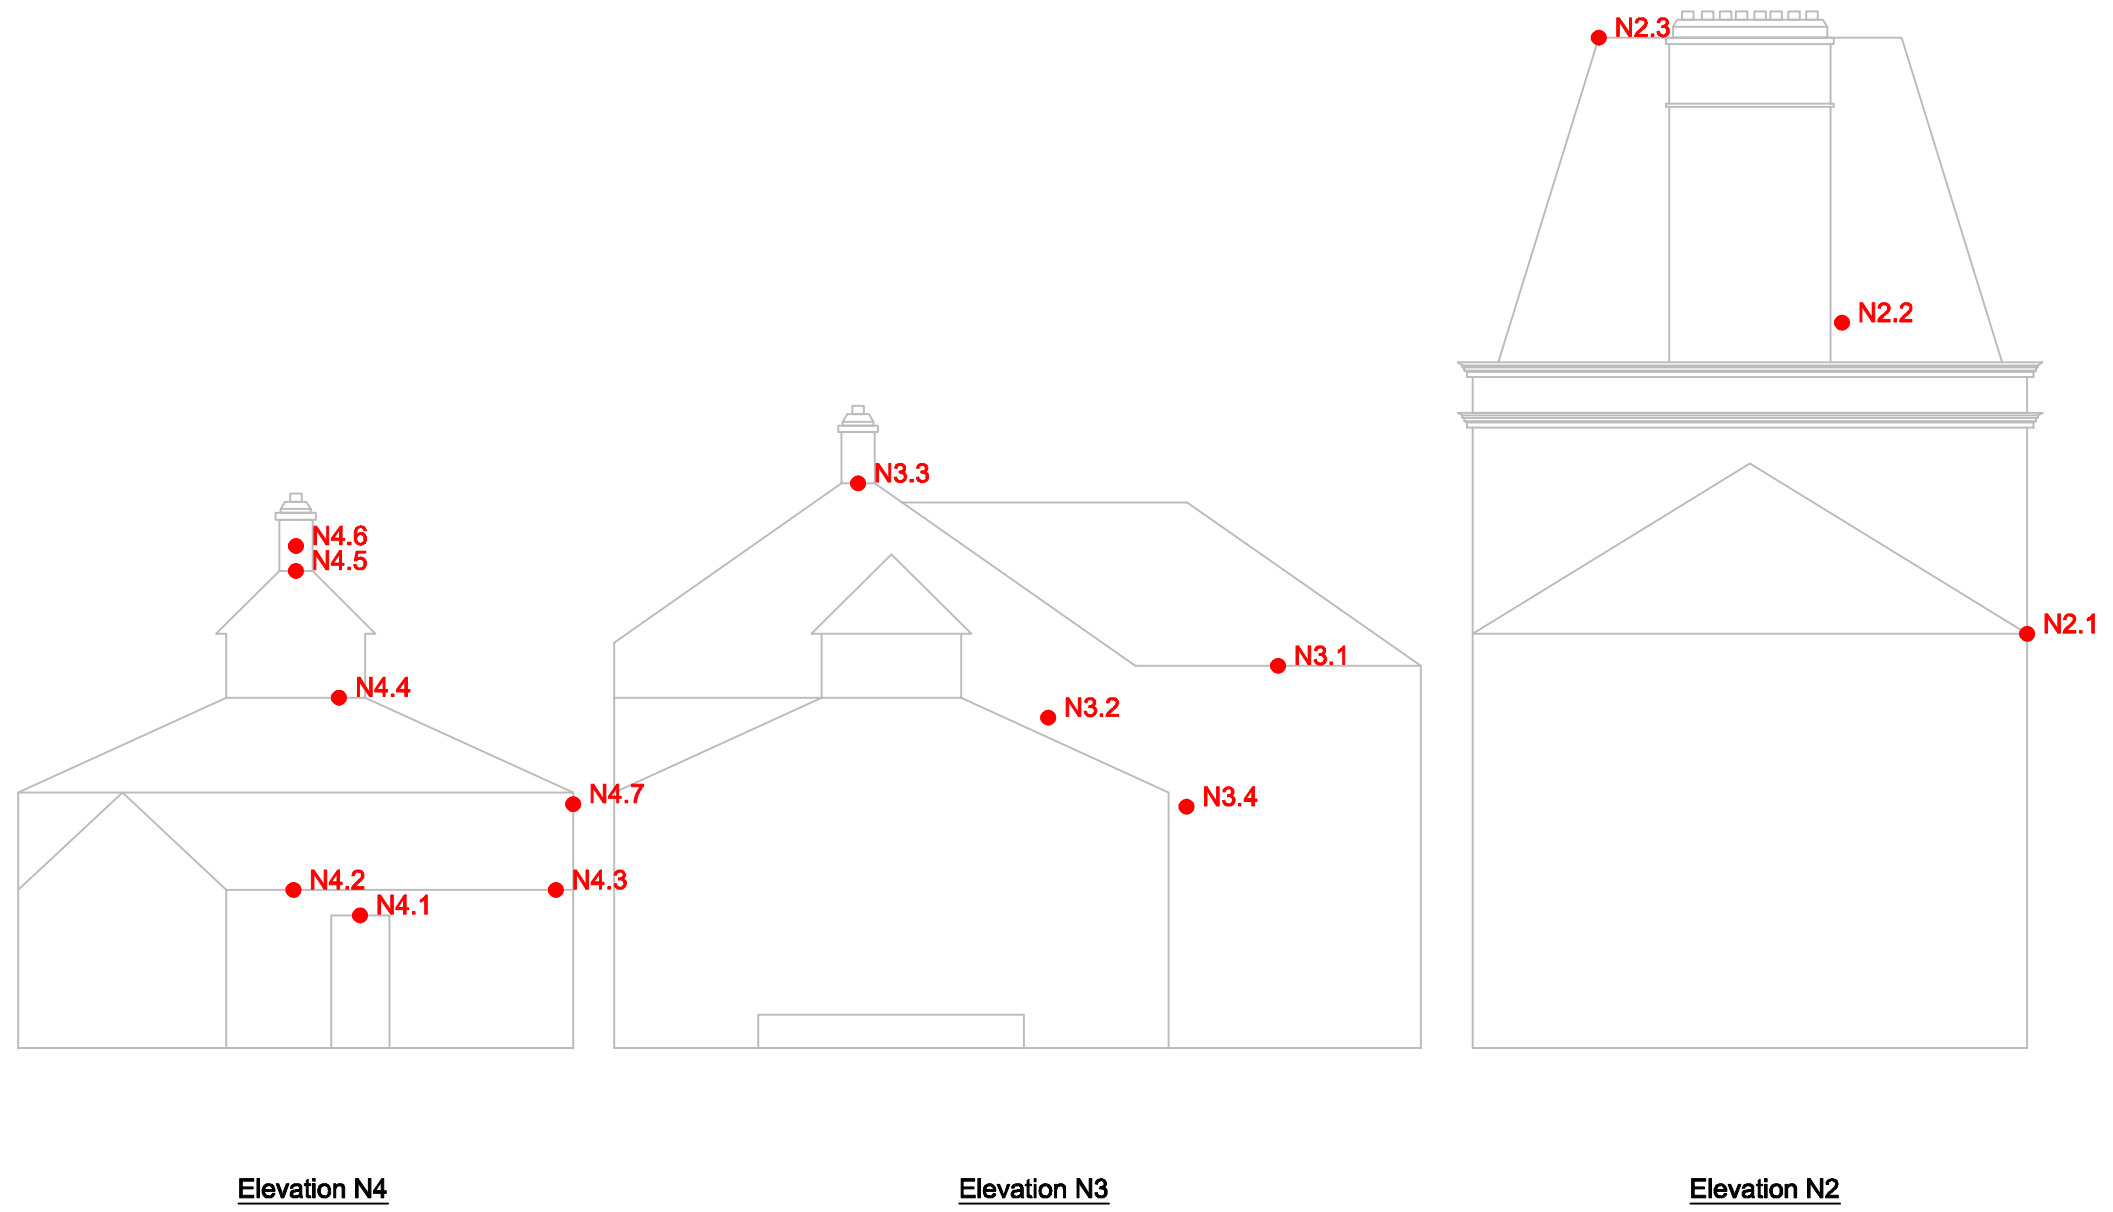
Elevation N2, N3, N4 of Station Hotel Building showing Defect/Observation Locations
